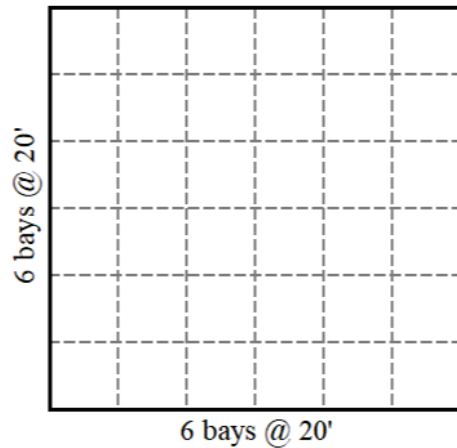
Baseline RC moment frame building typical 12-story plan.
